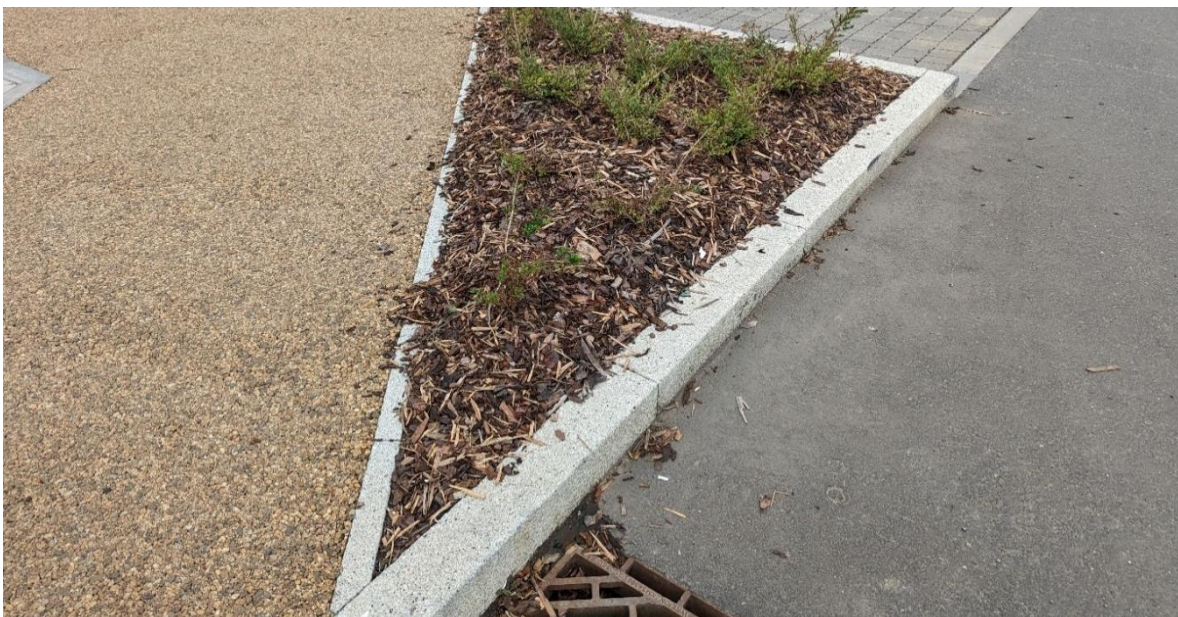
Missed Opportunity - Landscaping planter adjacent to car parking (WCC, 2022)
